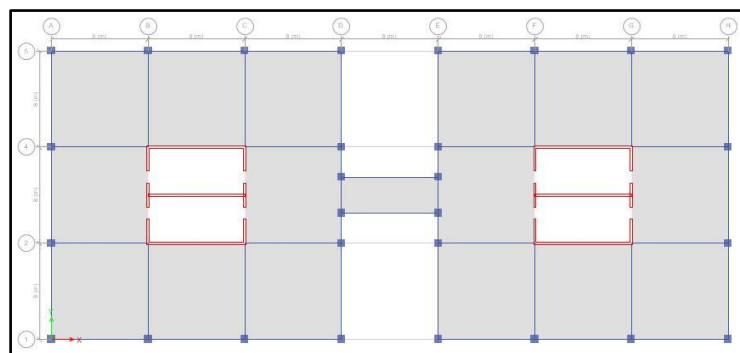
PLAN VIEW OF THE BUILDING WITH 8m SPAN CONNECTING CORRIDOR
